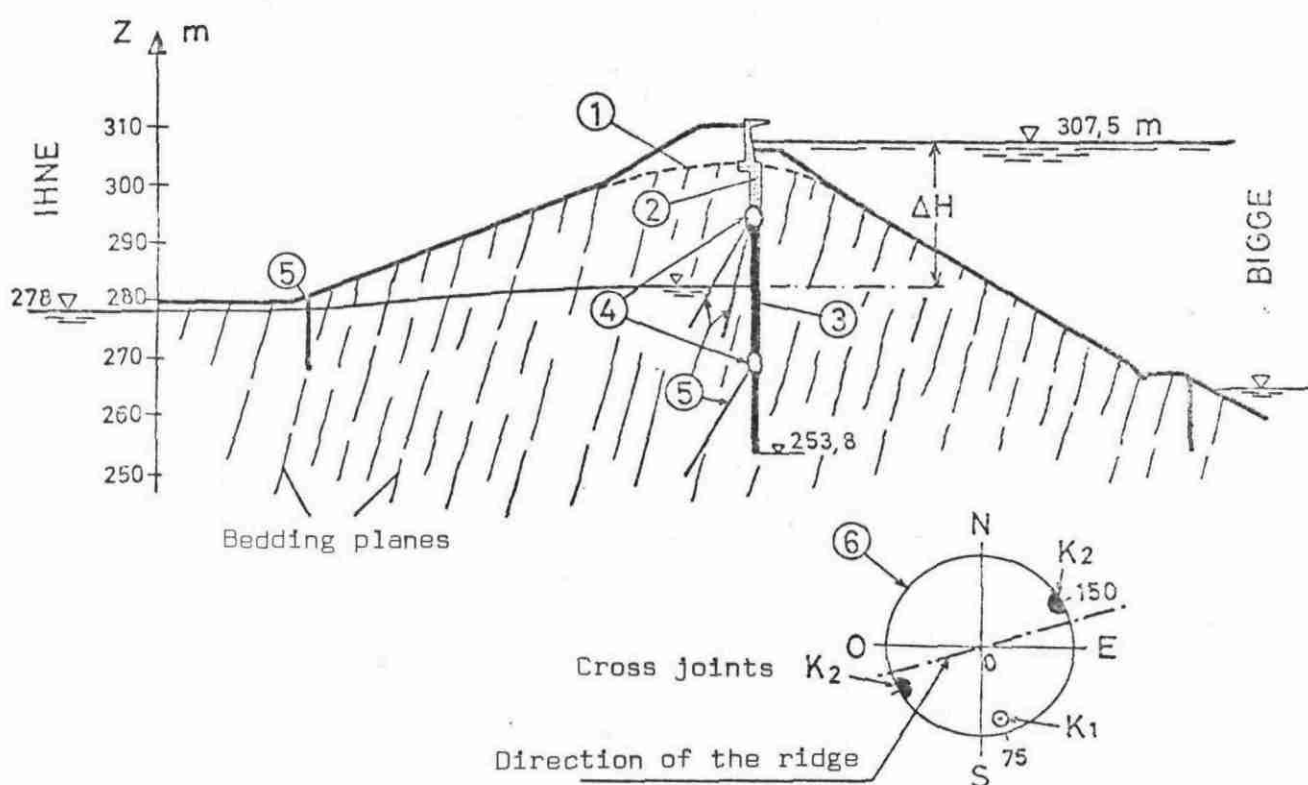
Cross section of the ridge "Kraghammer Sattel"
